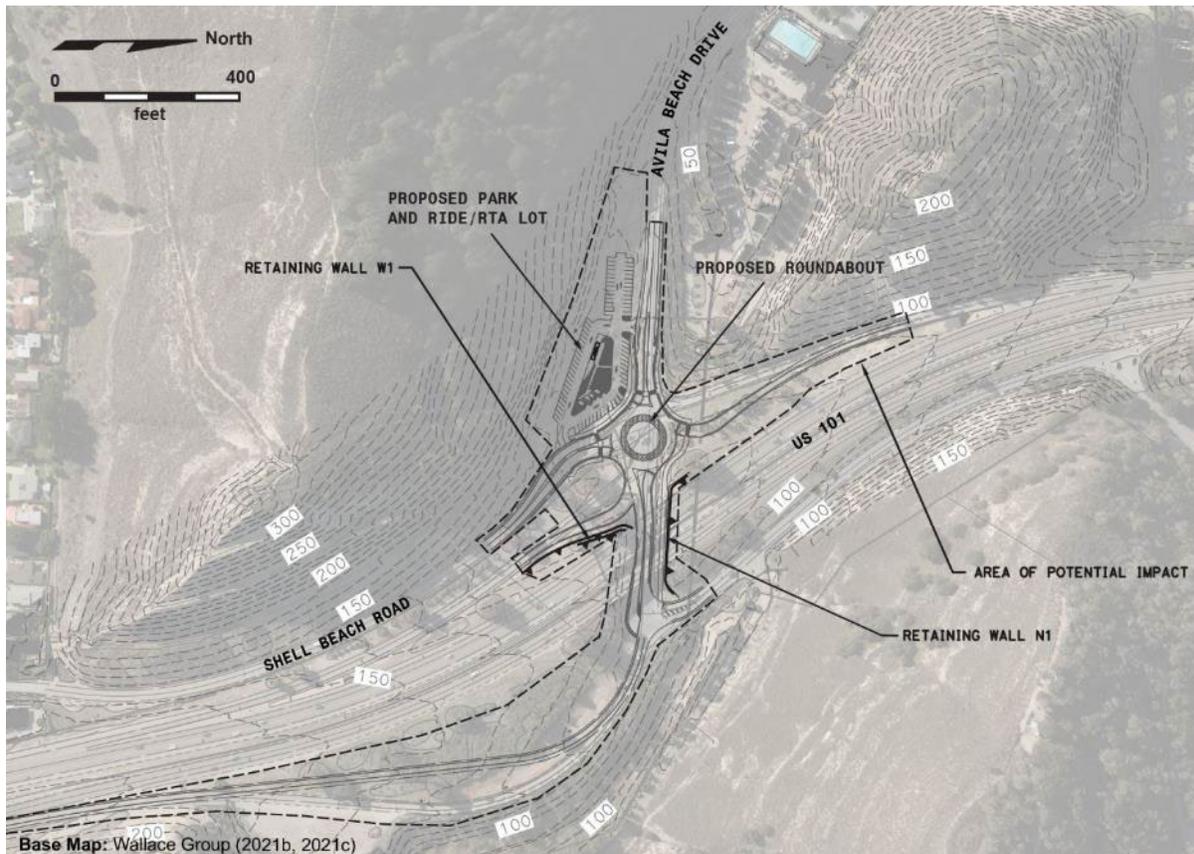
Proposed Layout (Wallace Group 2021b, 2021c)
